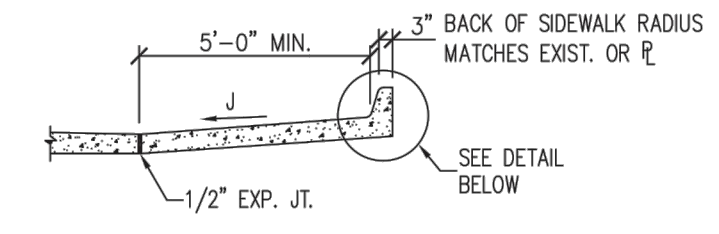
DETAIL A MINIMAL R.O.W. FOR SIDEWALK AT BACK OF CURB PERPENDICULAR RAMP
